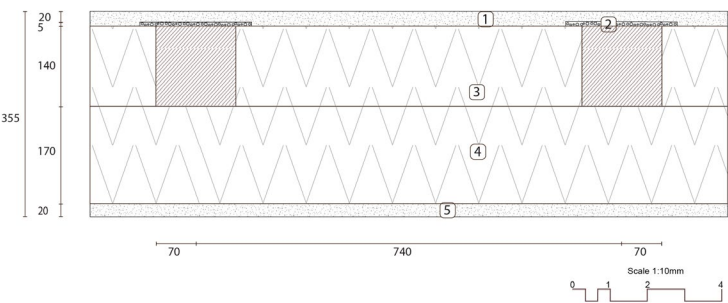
Ground-floor wall callout - Scale 1:10 (Author's drawing)
